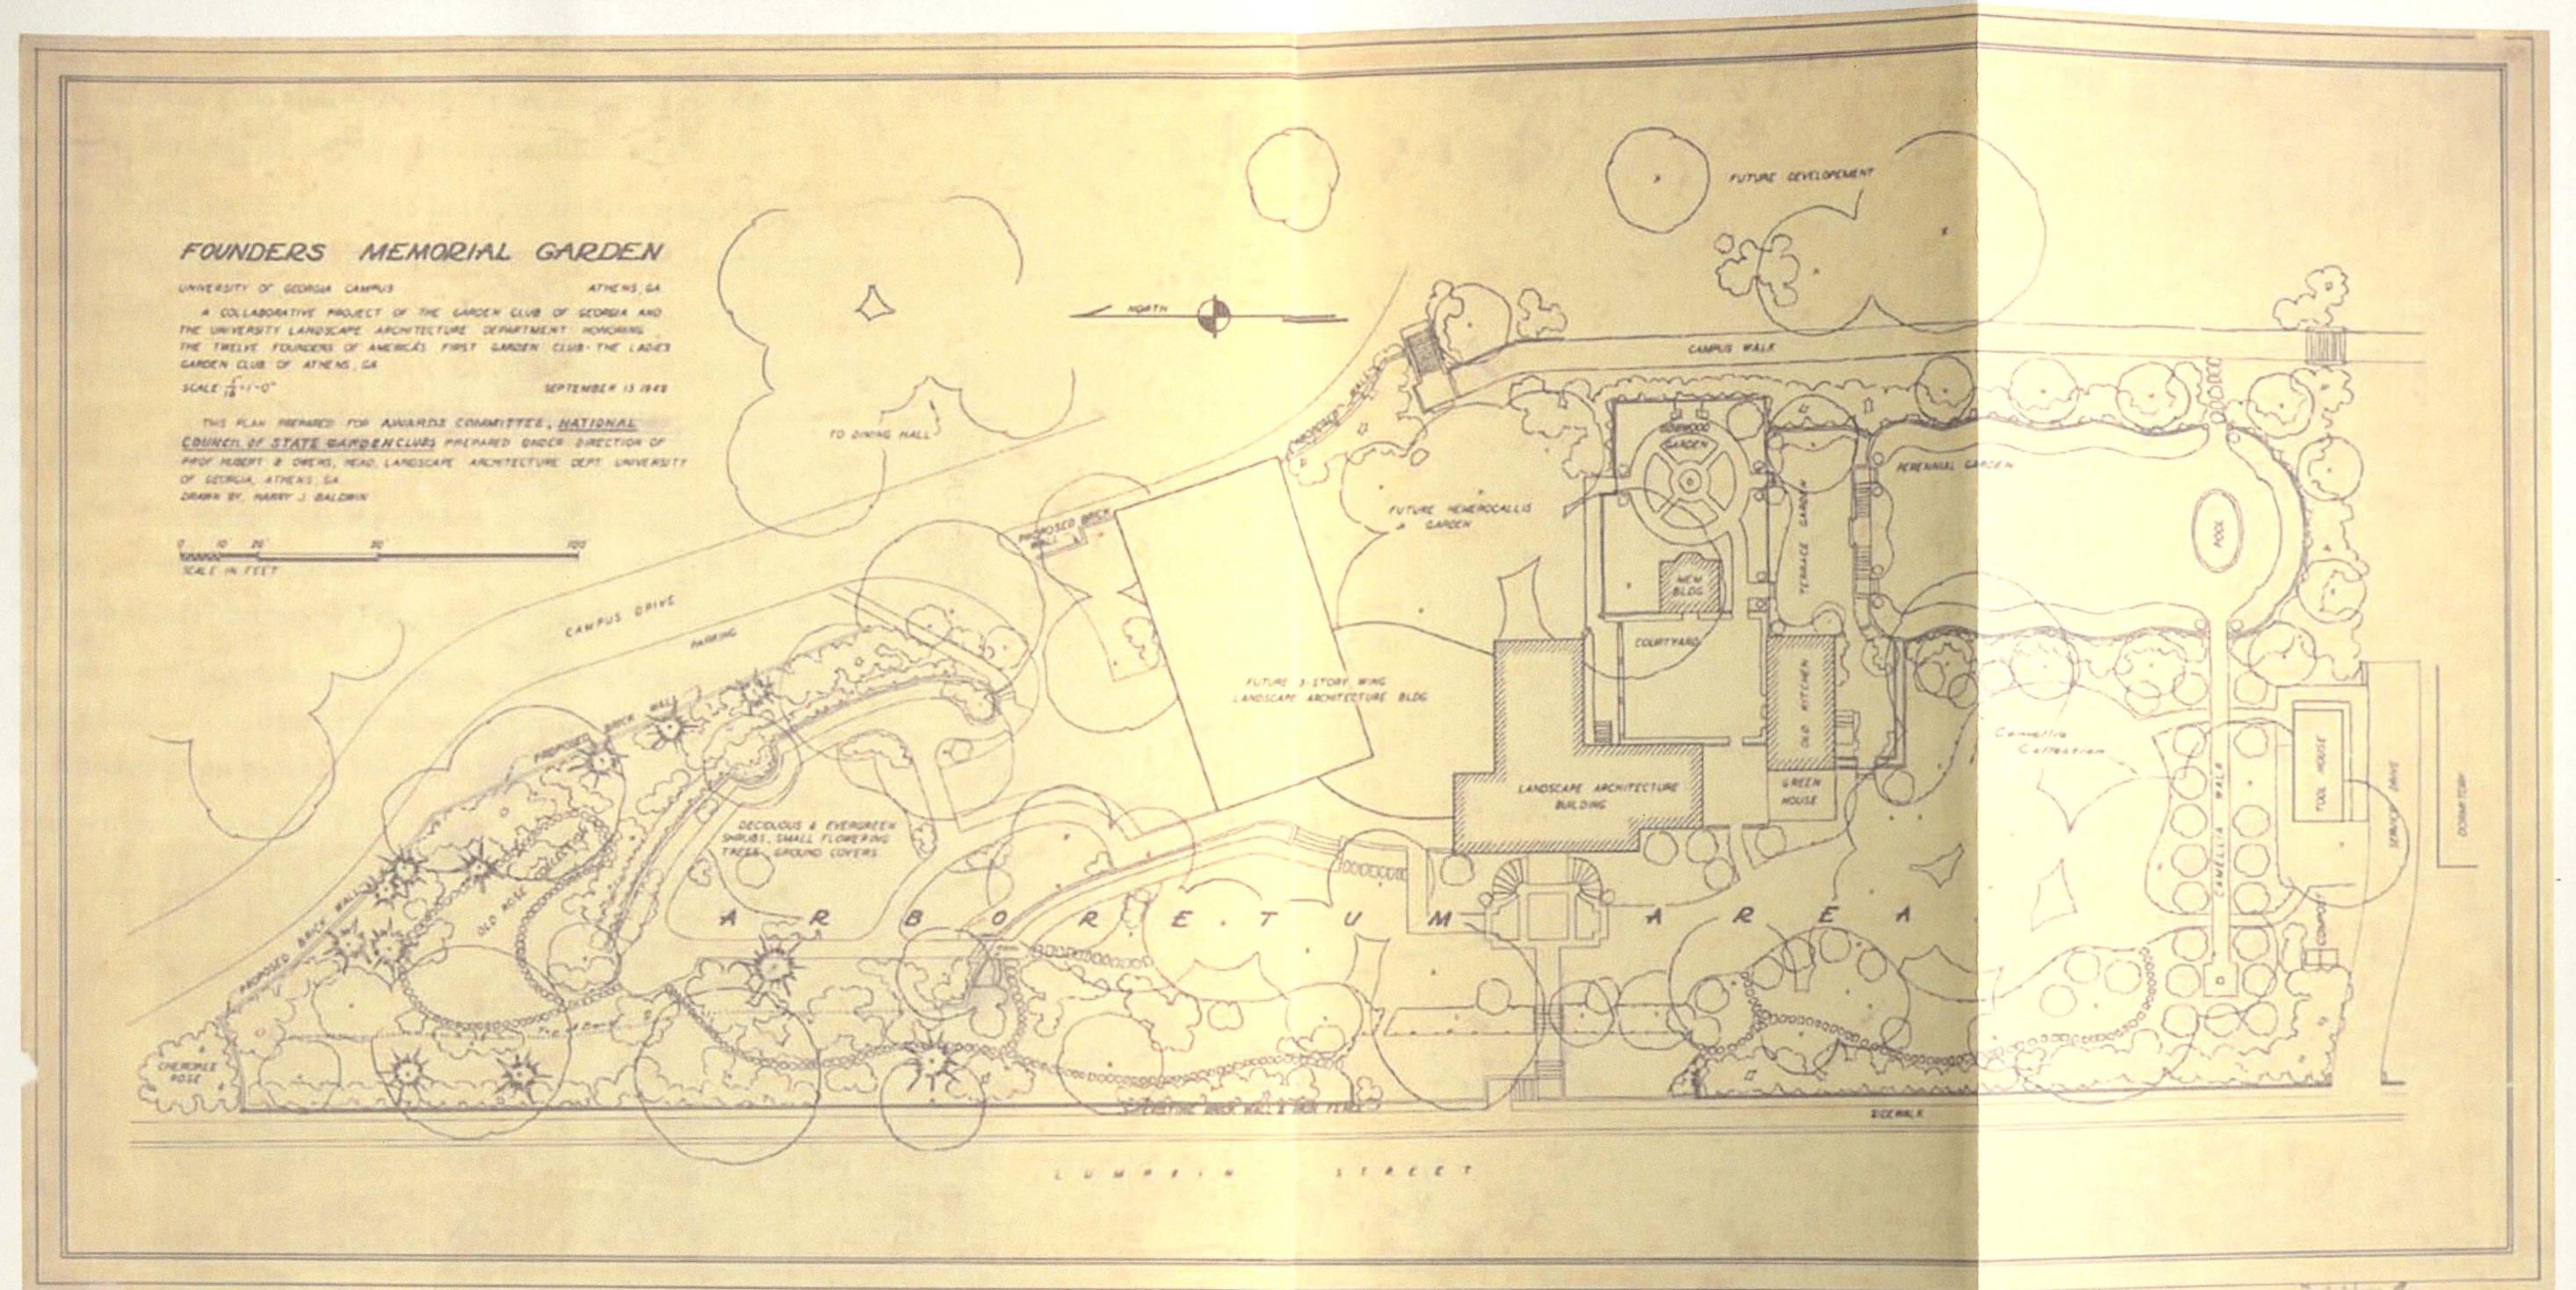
1949 Harry Baldwin Plan. Note proposed building addition.
